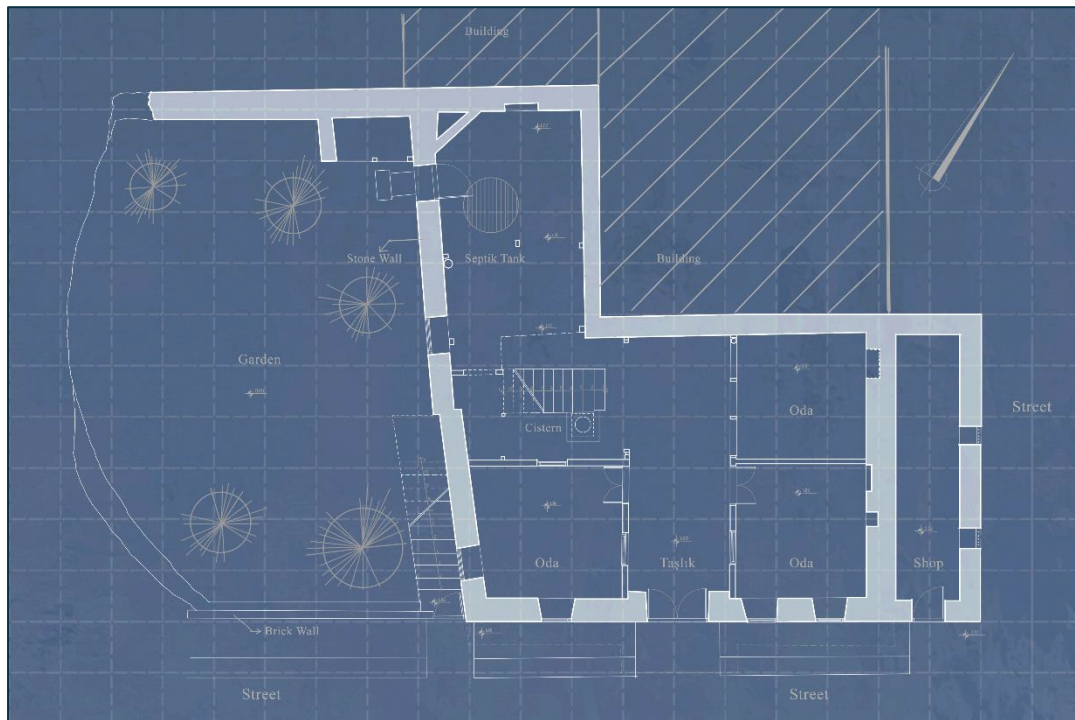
Ground floor pre intervention plan of Building A. Prepared by the Author based on the original documentation drawings.
